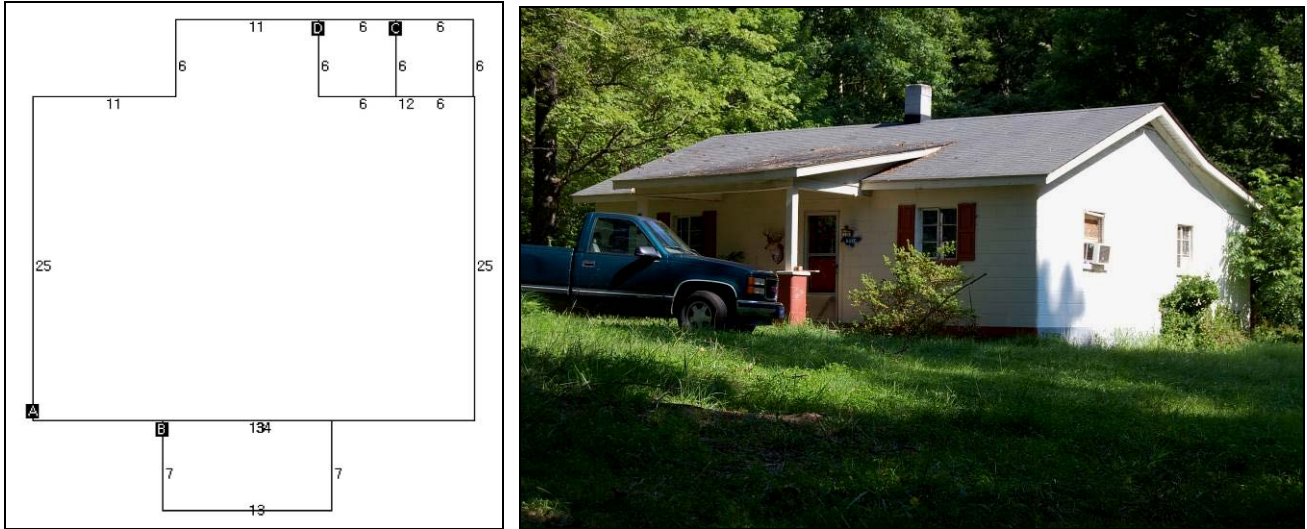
Tax sketch of tenant house with front (south) facade at bottom; photograph depicts east side elevation at right and south facade at center; note kick of roof at northeast corner at far right
